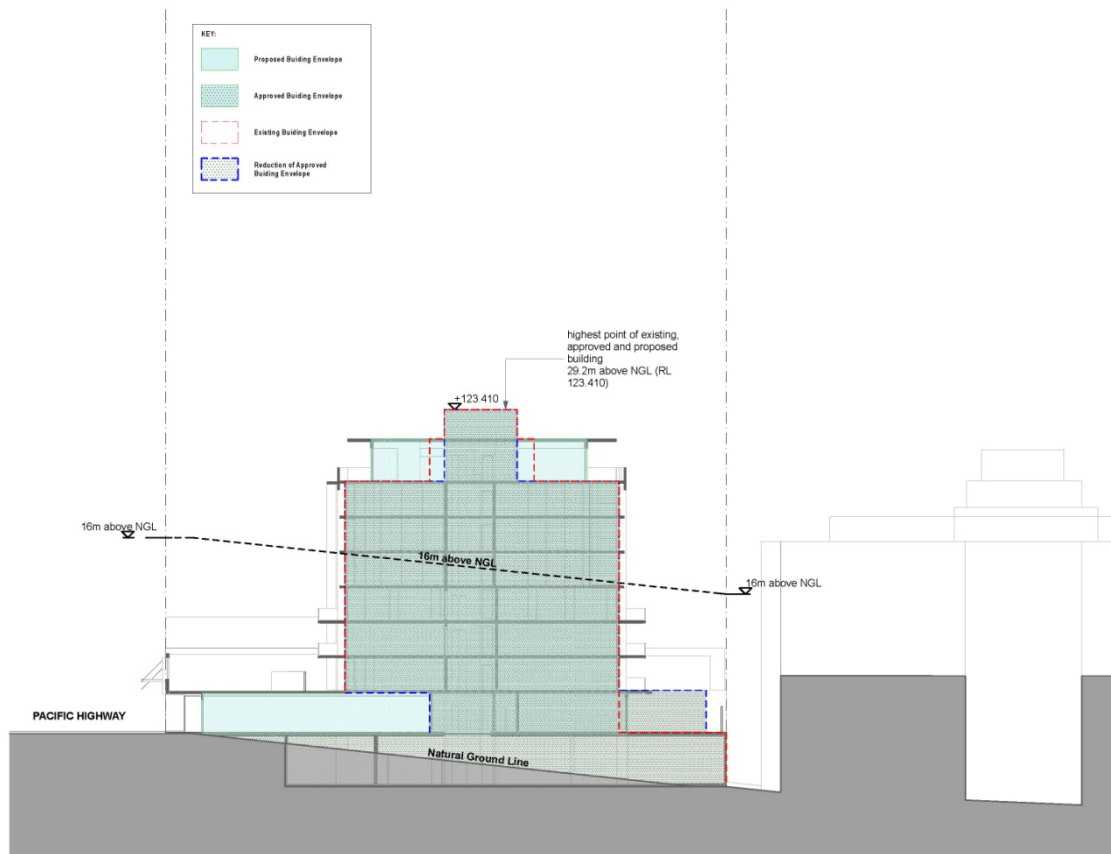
Figure B - Building 2 height compliance plan (existing, approved/commenced and proposed) (Source JPRA)
